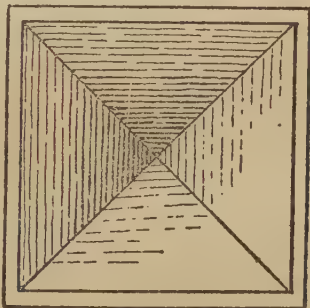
PLAN OF MOULD FOR CONCRETE CAPPING
